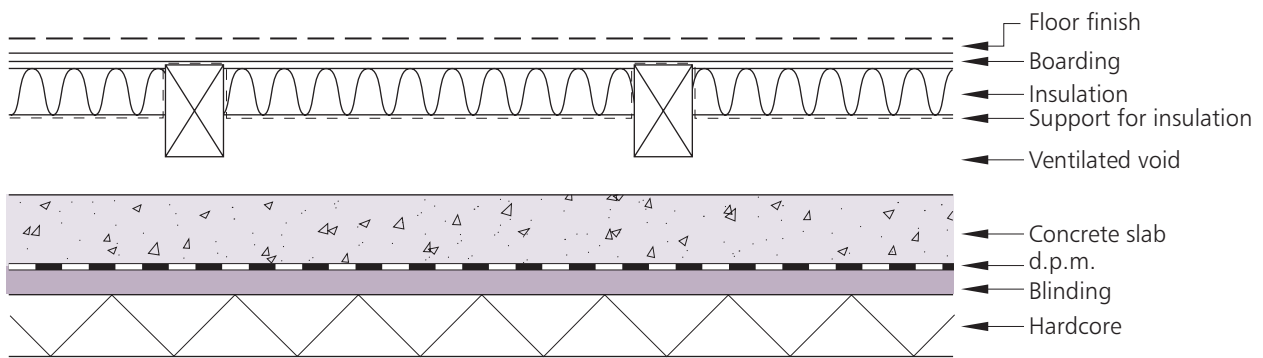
shows floor insulation above slab and there is laboratory evidence to support this location but there is currently no sound evidence to prevent the use of below slab insulation.
